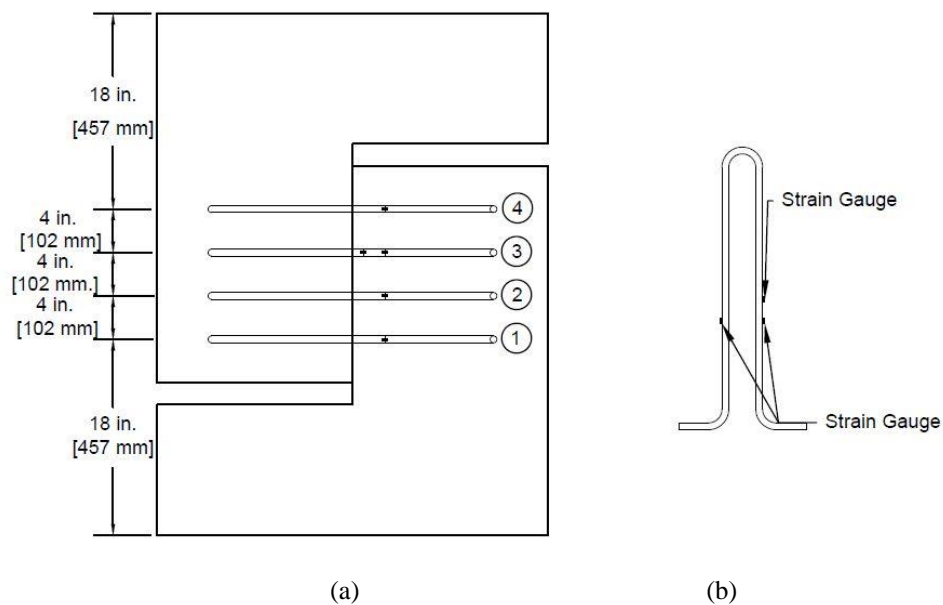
(a) Internal instrumentation elevation for specimens constructed with 4 reinforcing steel U-bars; (b) U-bar.
